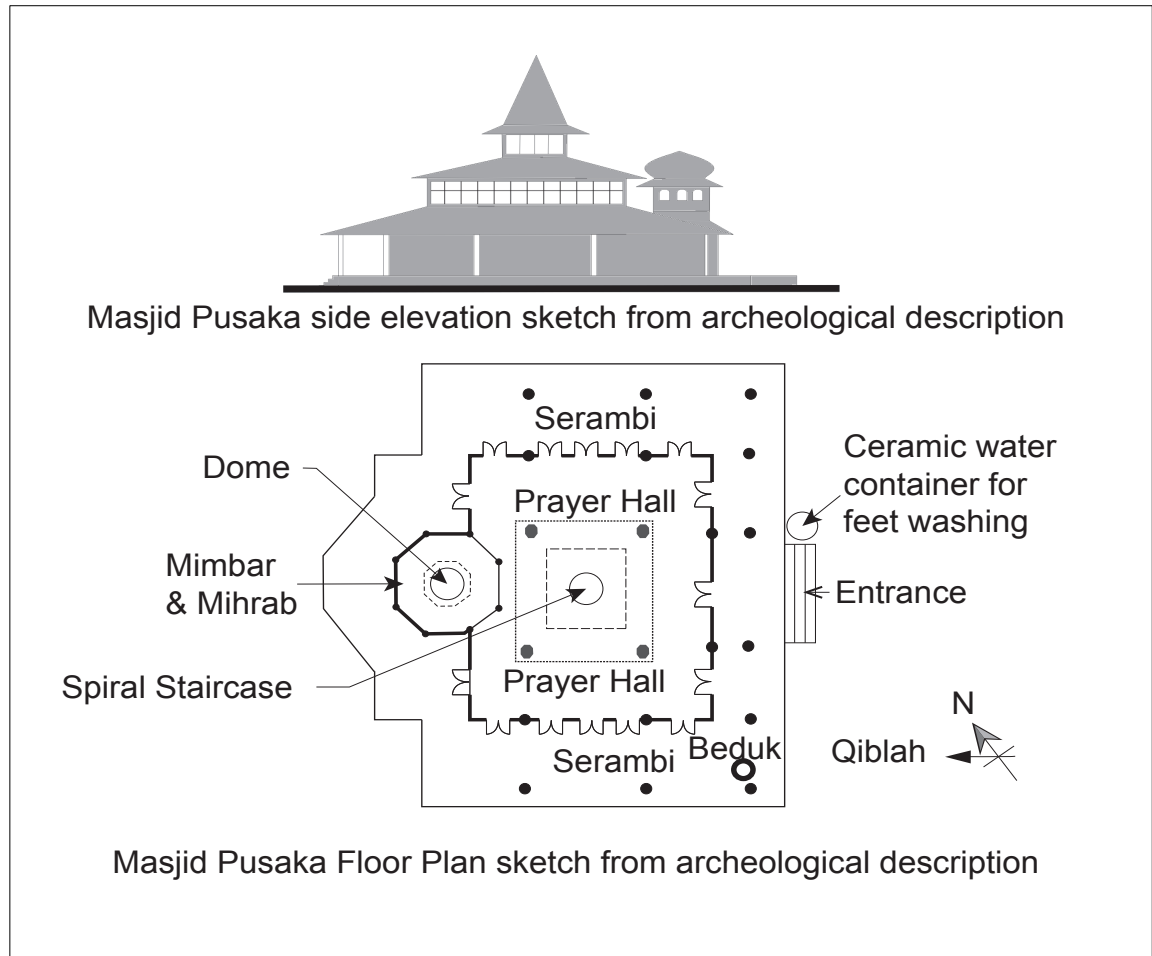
Masjid Pusaka floor plan and side elevation
